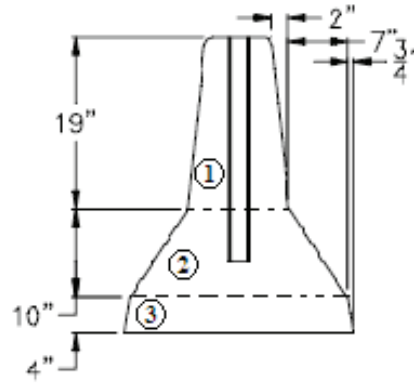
Dimensions of the barrier segment cross-section (in inches) [1, 2]
